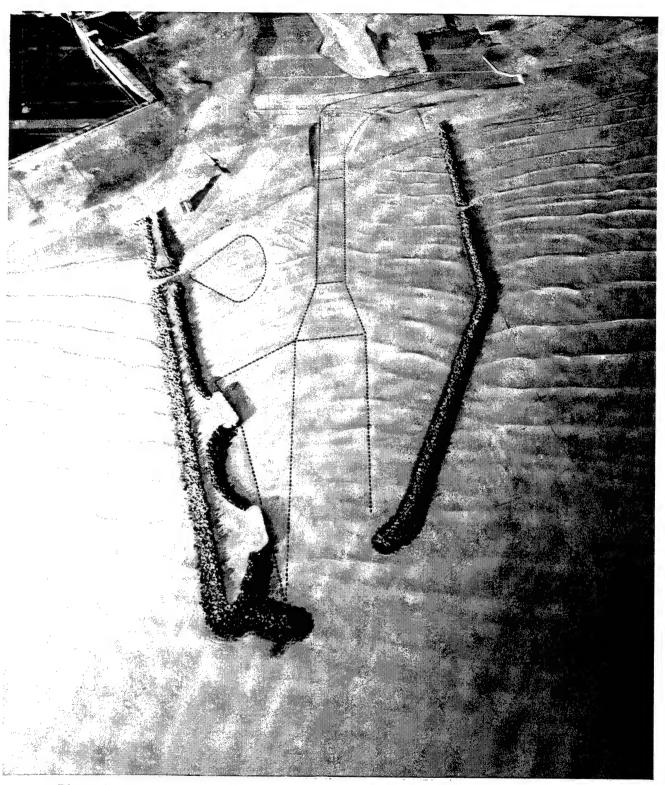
Typical wave patterns for Plan 19; 9-sec, 2-m (6.6-ft) waves from 227 deg; swl = +0.5-m (+1.6-ft)
